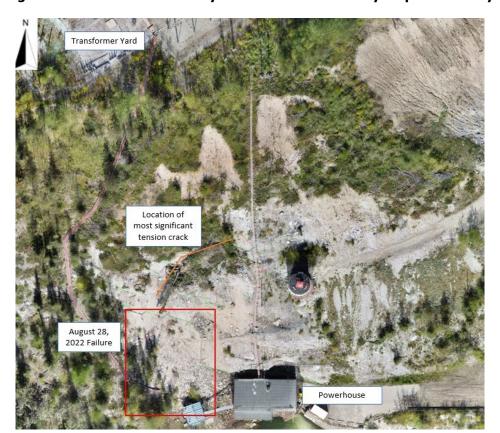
A-1: Overview of Mayo A Facilities affected by Slope Instability
